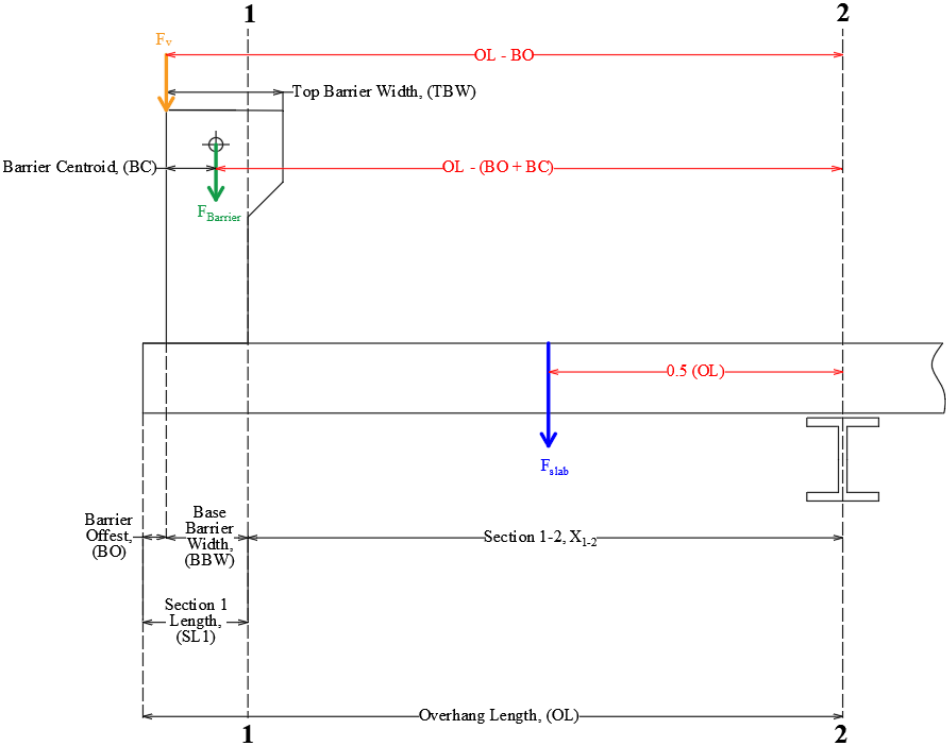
Side View of Design Case 2, Section 2-2 Impact
